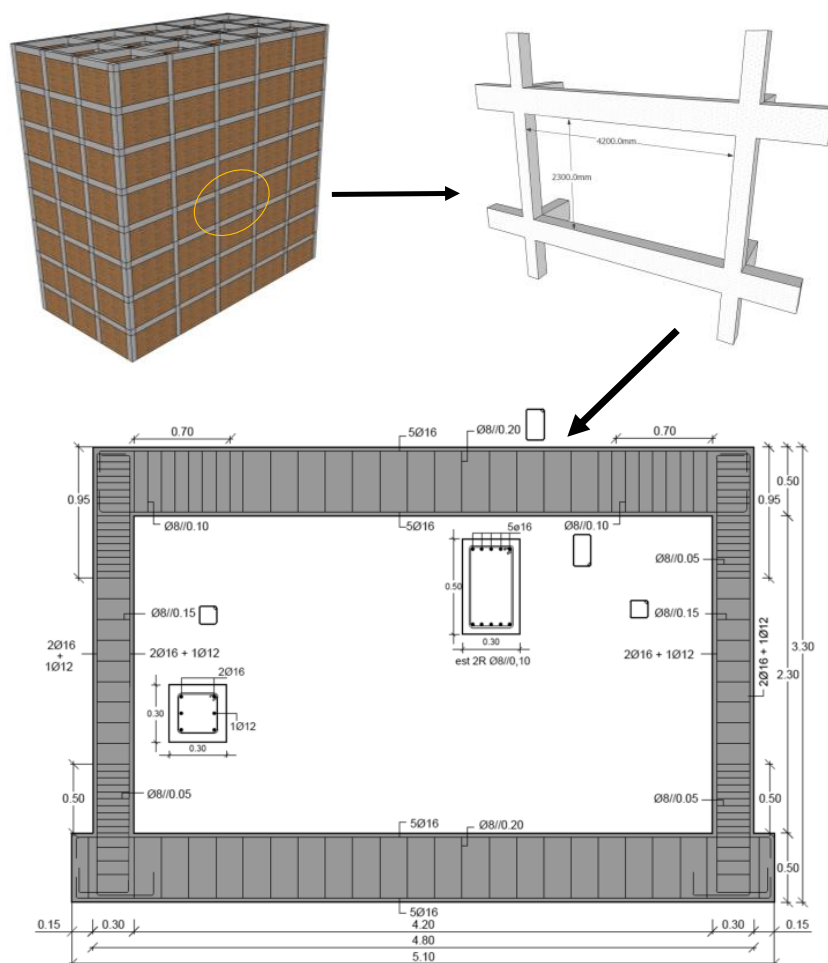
Prototype specimen: geometric dimensions of the frame selected and reinforcement detailing.
